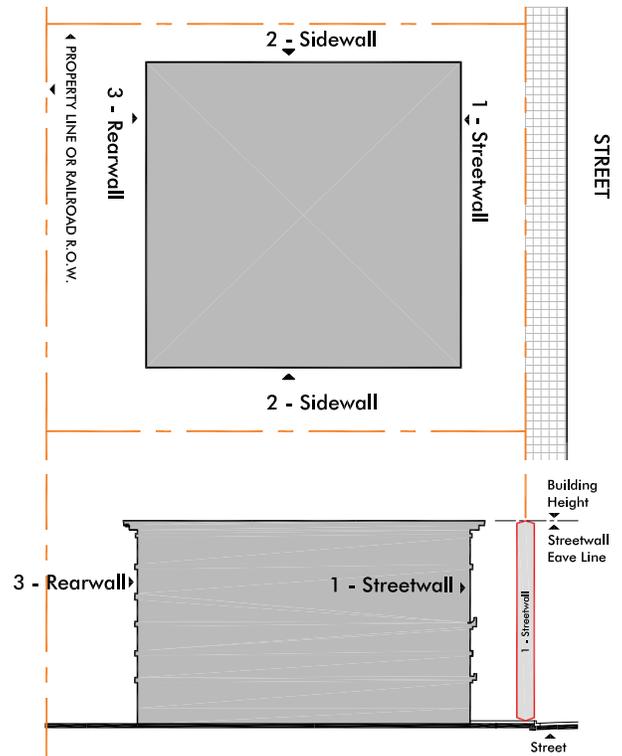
SUMMARY OF ELEMENTS IN PLAN & SECTION
